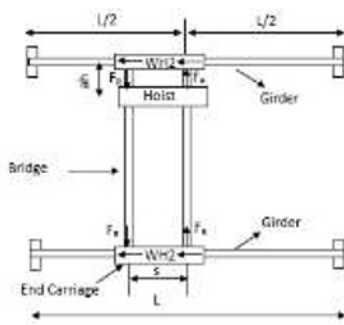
Crane layout & crabbing forces for maximum horizontal moment
